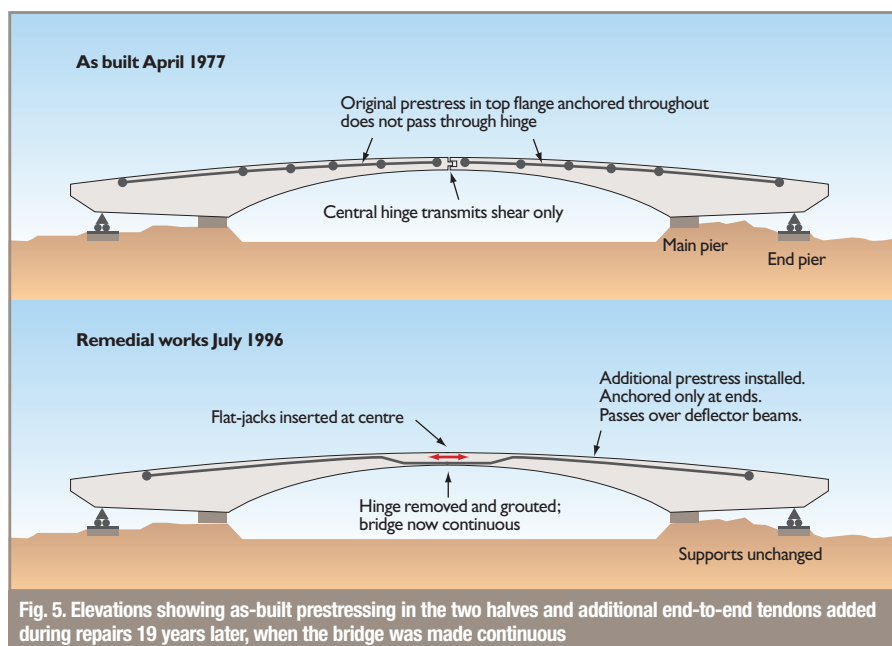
Elevations showing as-built prestressing in the two halves and additional end-to-end tendons added during repairs 19 years later, when the bridge was made continuous
